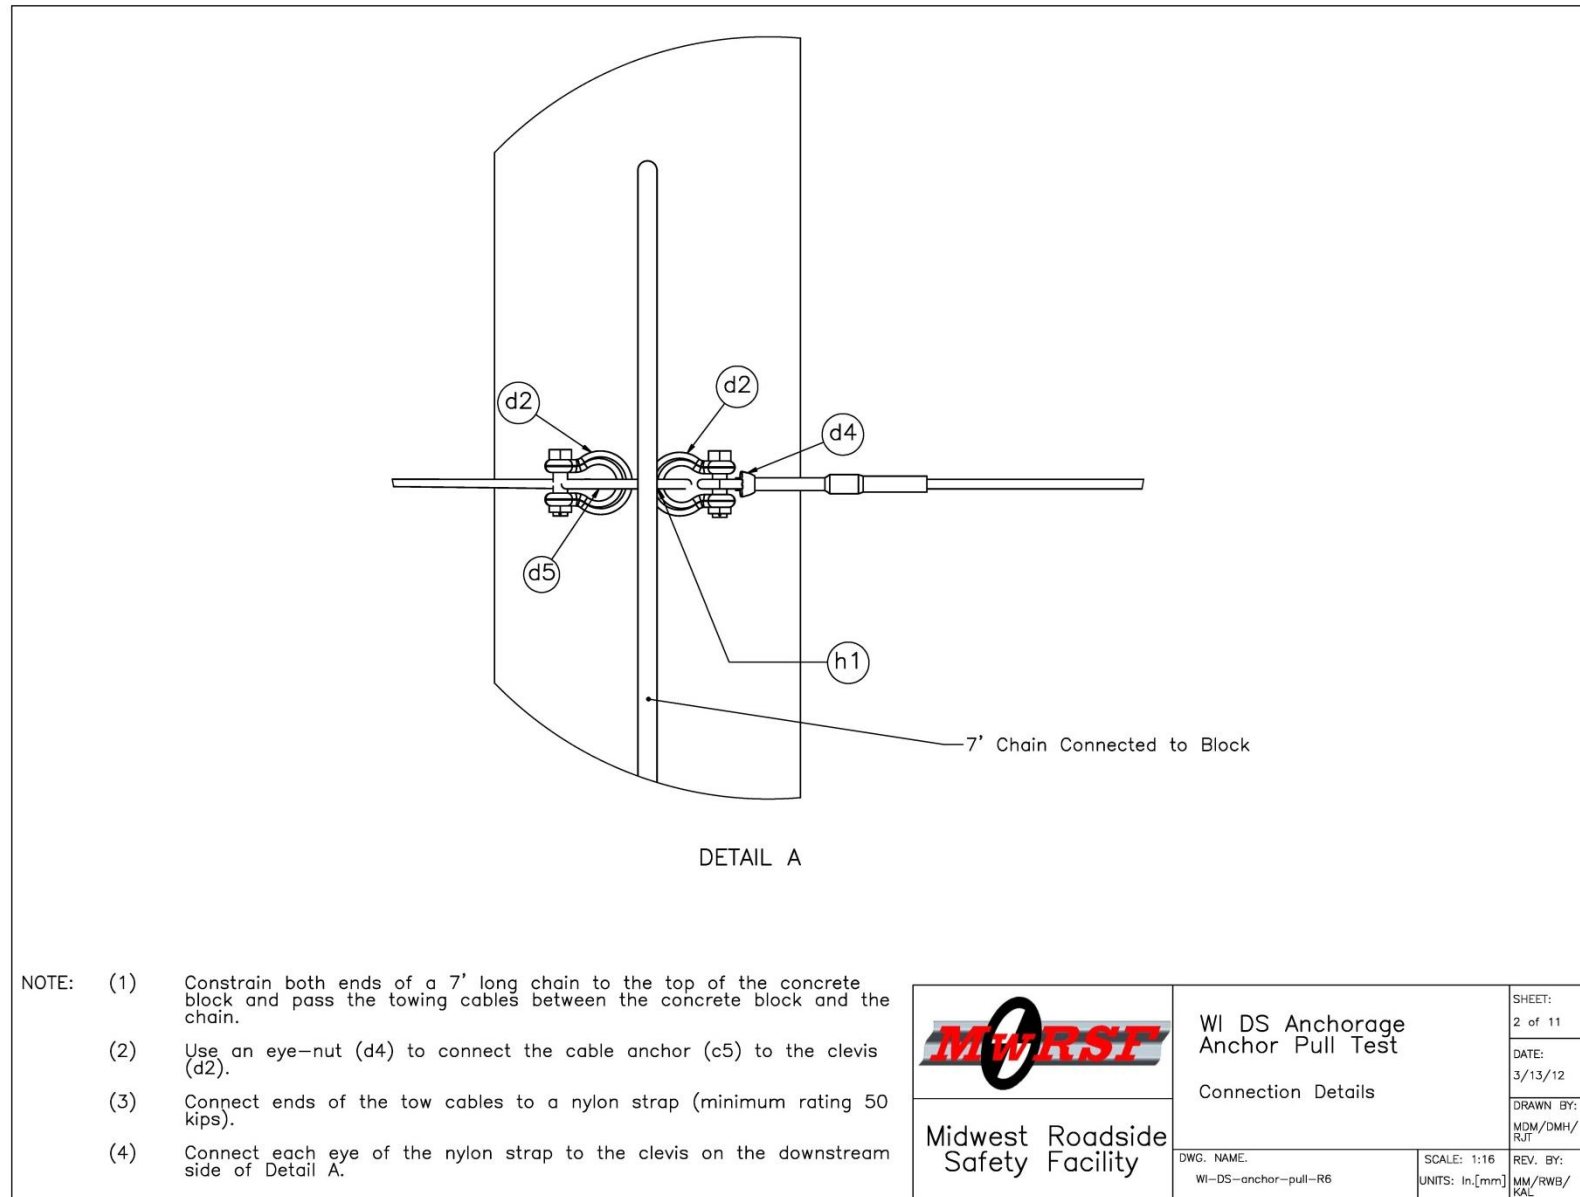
Connection Details, Test Nos. DSAP-1 and DSAP-2
